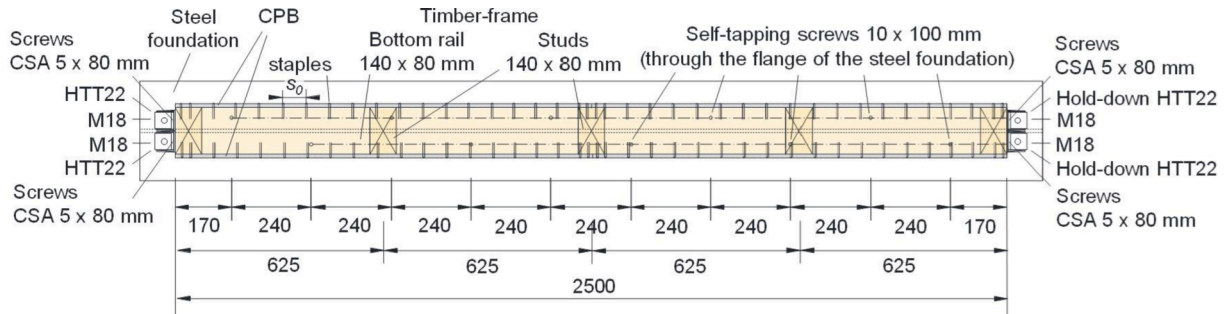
Cross section of the basic panel with CPB sheathing, anchored to the steel foundation.
